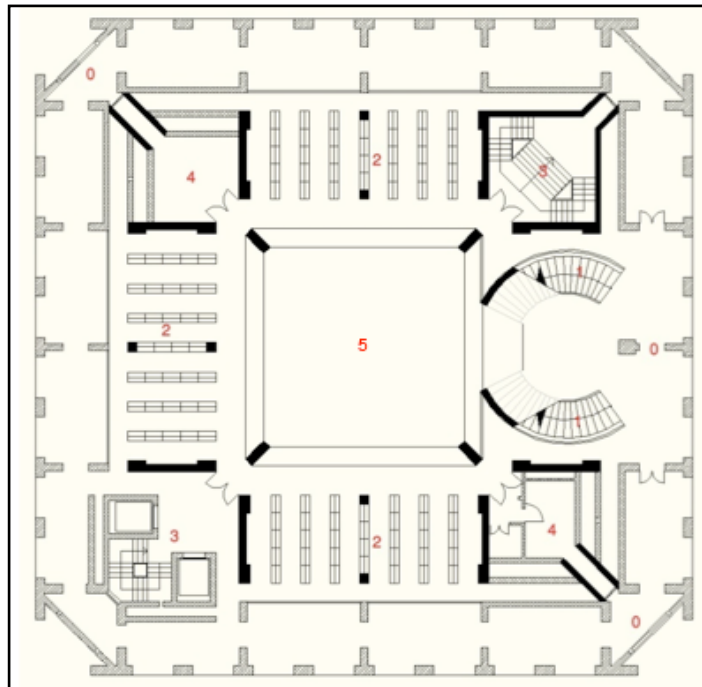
Exeter Library, Ground Floor Plan (Re-drawn by Author)
